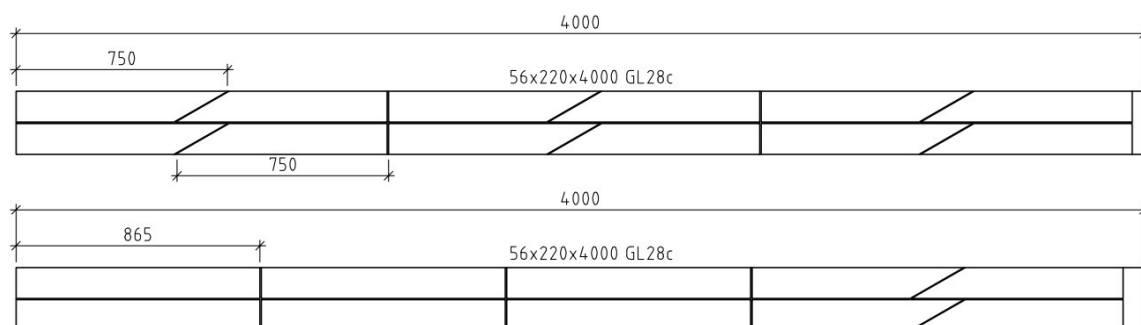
Cutting pattern for glulam, see drawing K-20-2-1002, Appendix D
